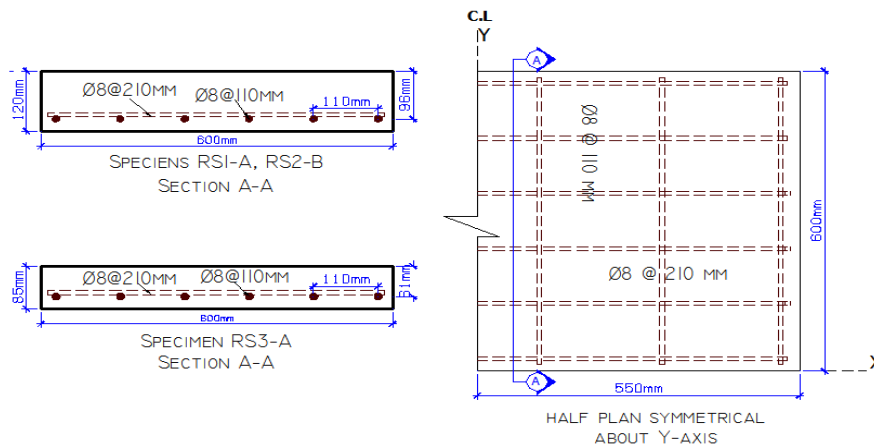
Reinforcement details of specimens RS1-A, RS2-B and RS3-A
